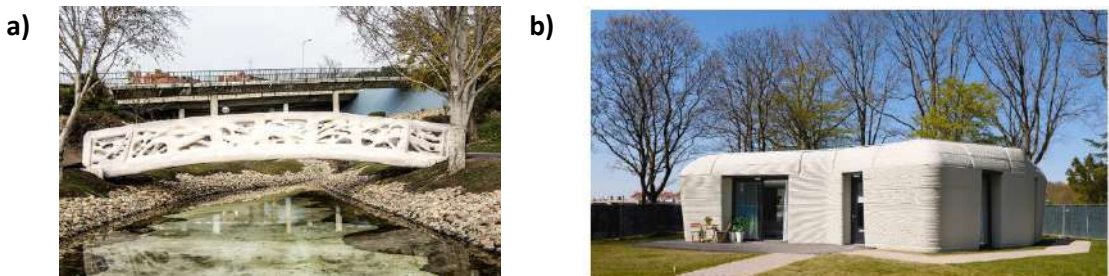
Representative example of using 3D printing technology in concrete structures: a) bridge in Madrid, Spain, b) Milestone House
